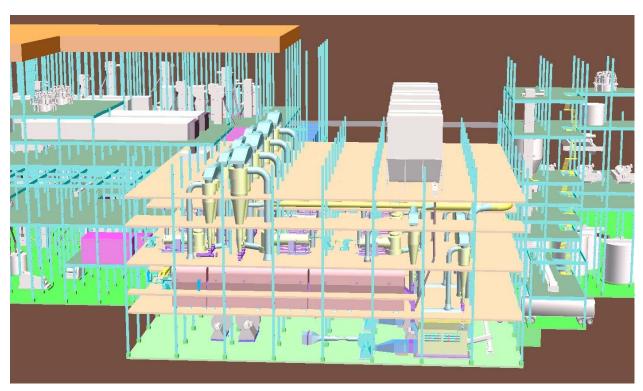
Area 24300 Polyhalite Calcining (looking south)
